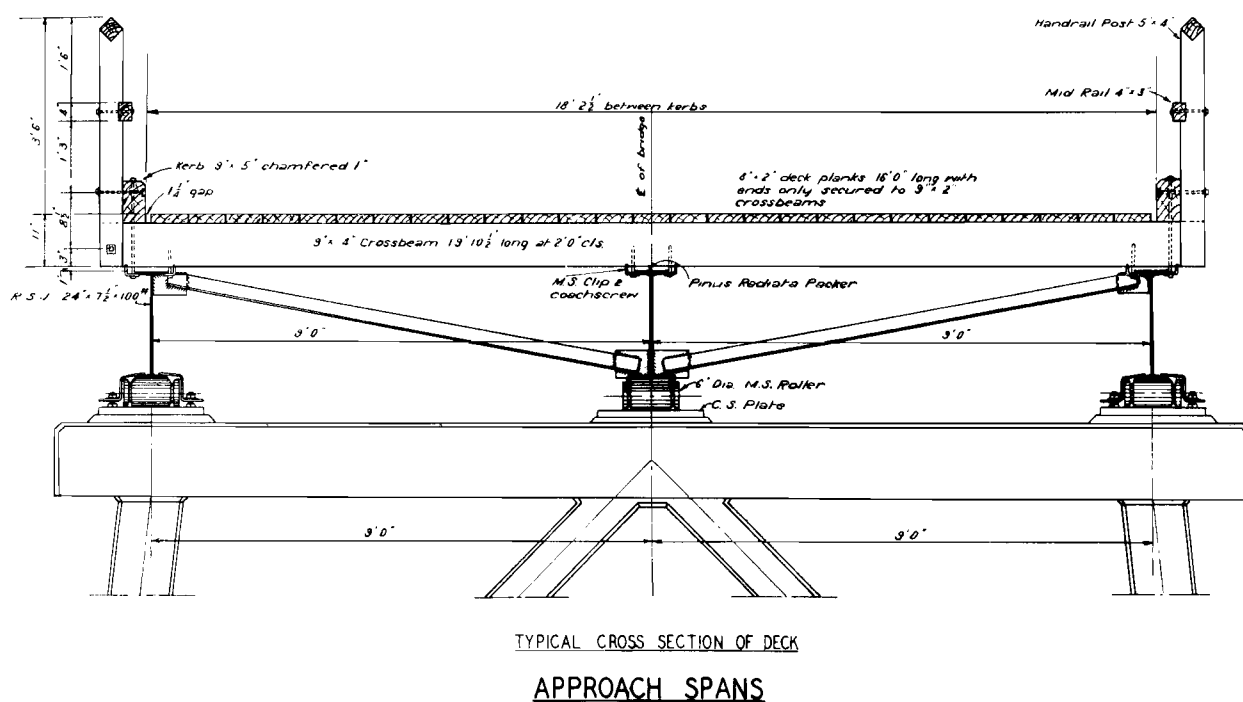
Fig. E.—Showing Cross Section of Approach Spans San Remo Bridge.
